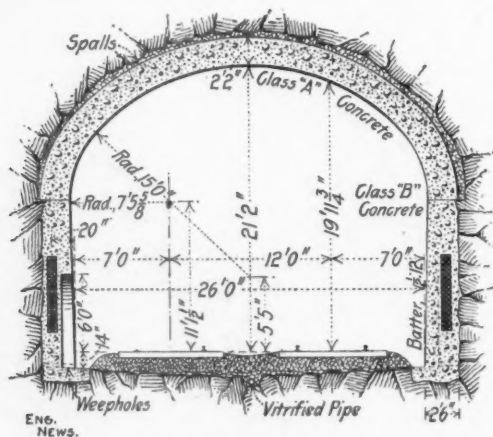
ST. MARY'S PARK TUNNEL SECTION.
